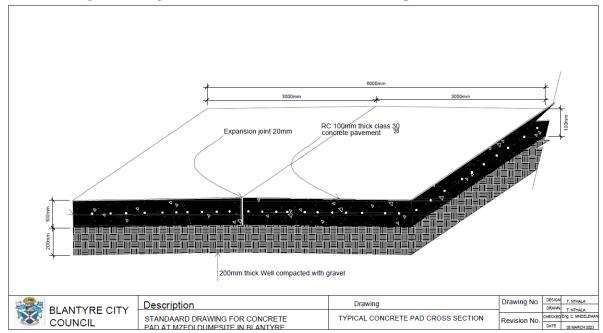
Drawing details for the access road to Mzedi Dumpsite
